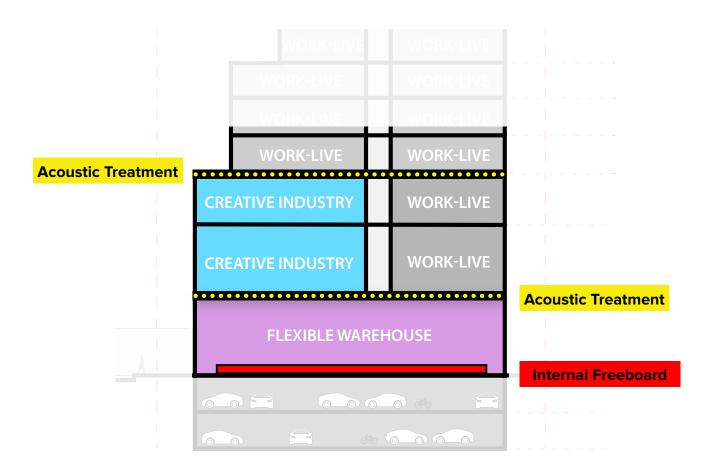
Indicative Section detailing Floor to Ceiling Heights to Accommodate Acoustic Measures and Internal Freeboarding
